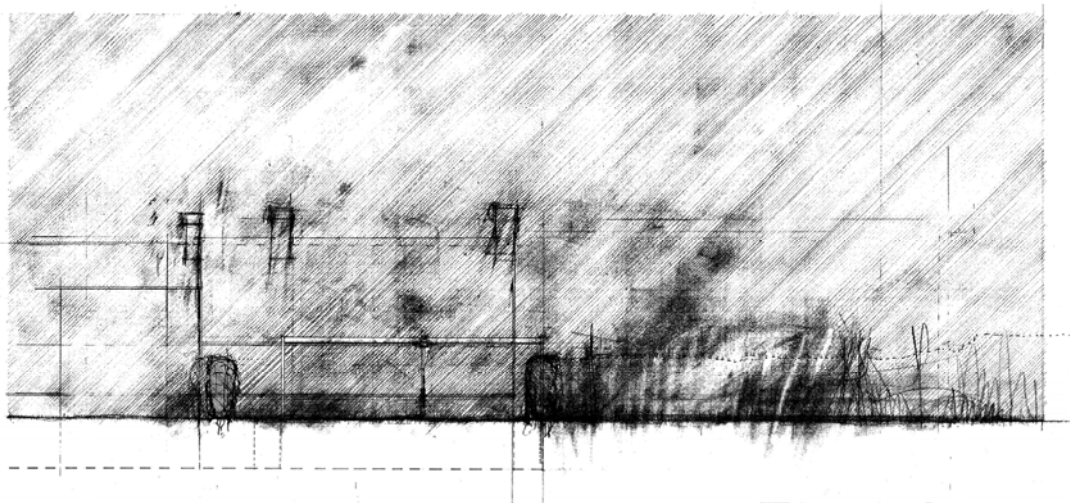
Elevation looking from Rosemary's garden towards the calendar and her house.
